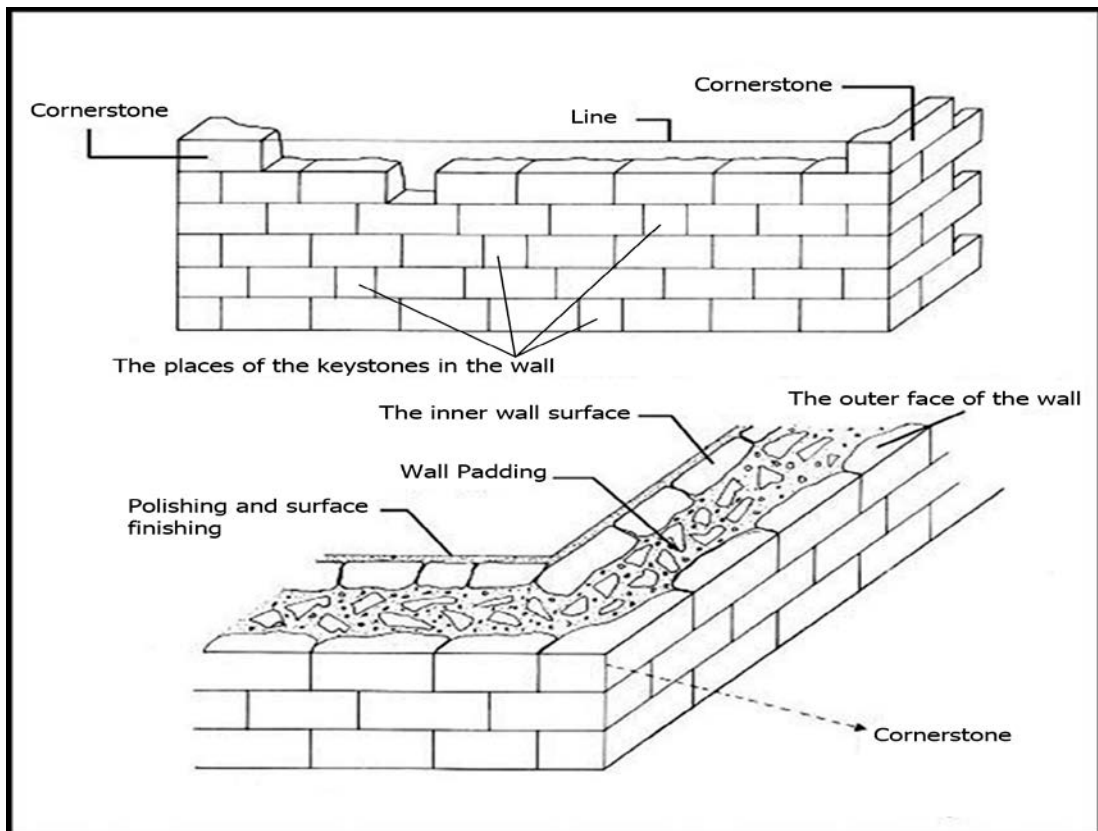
Section in a wall in a traditional PS house that shows the components and method of construction
